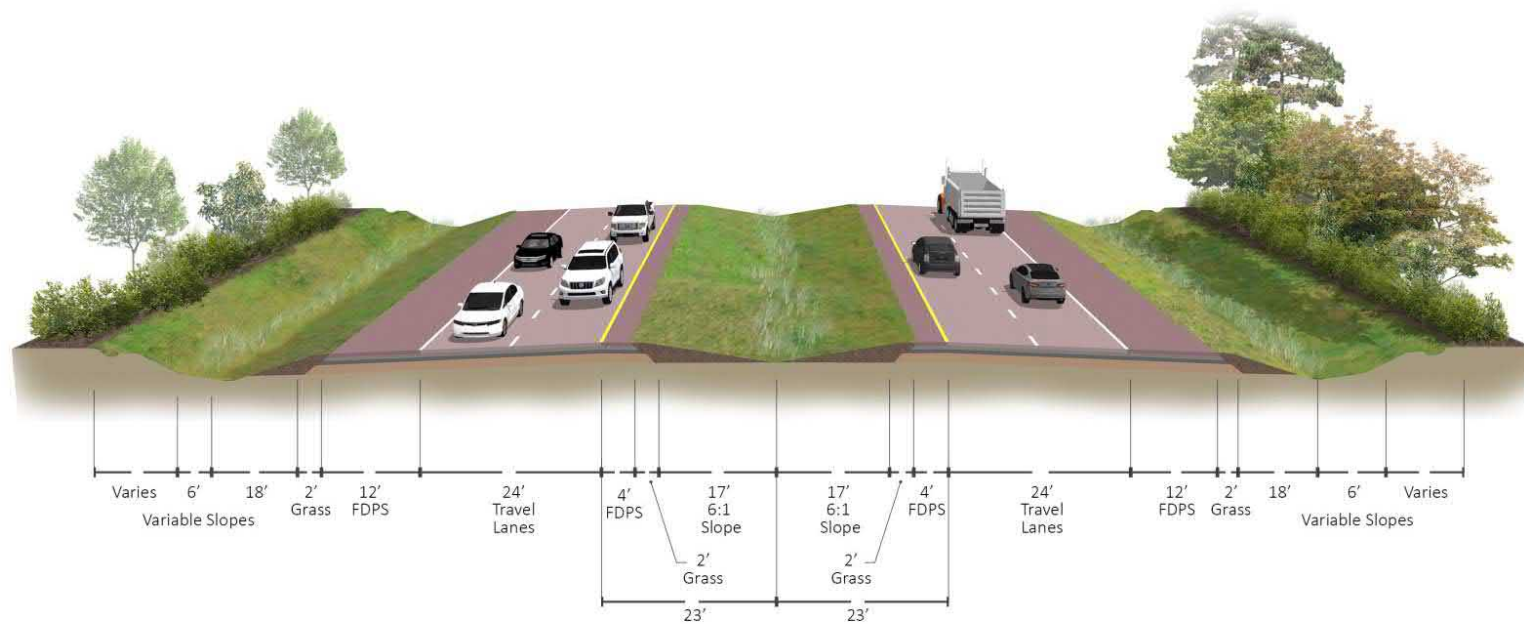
Current Detailed Study Alternatives Typical Section – four-lane divided
